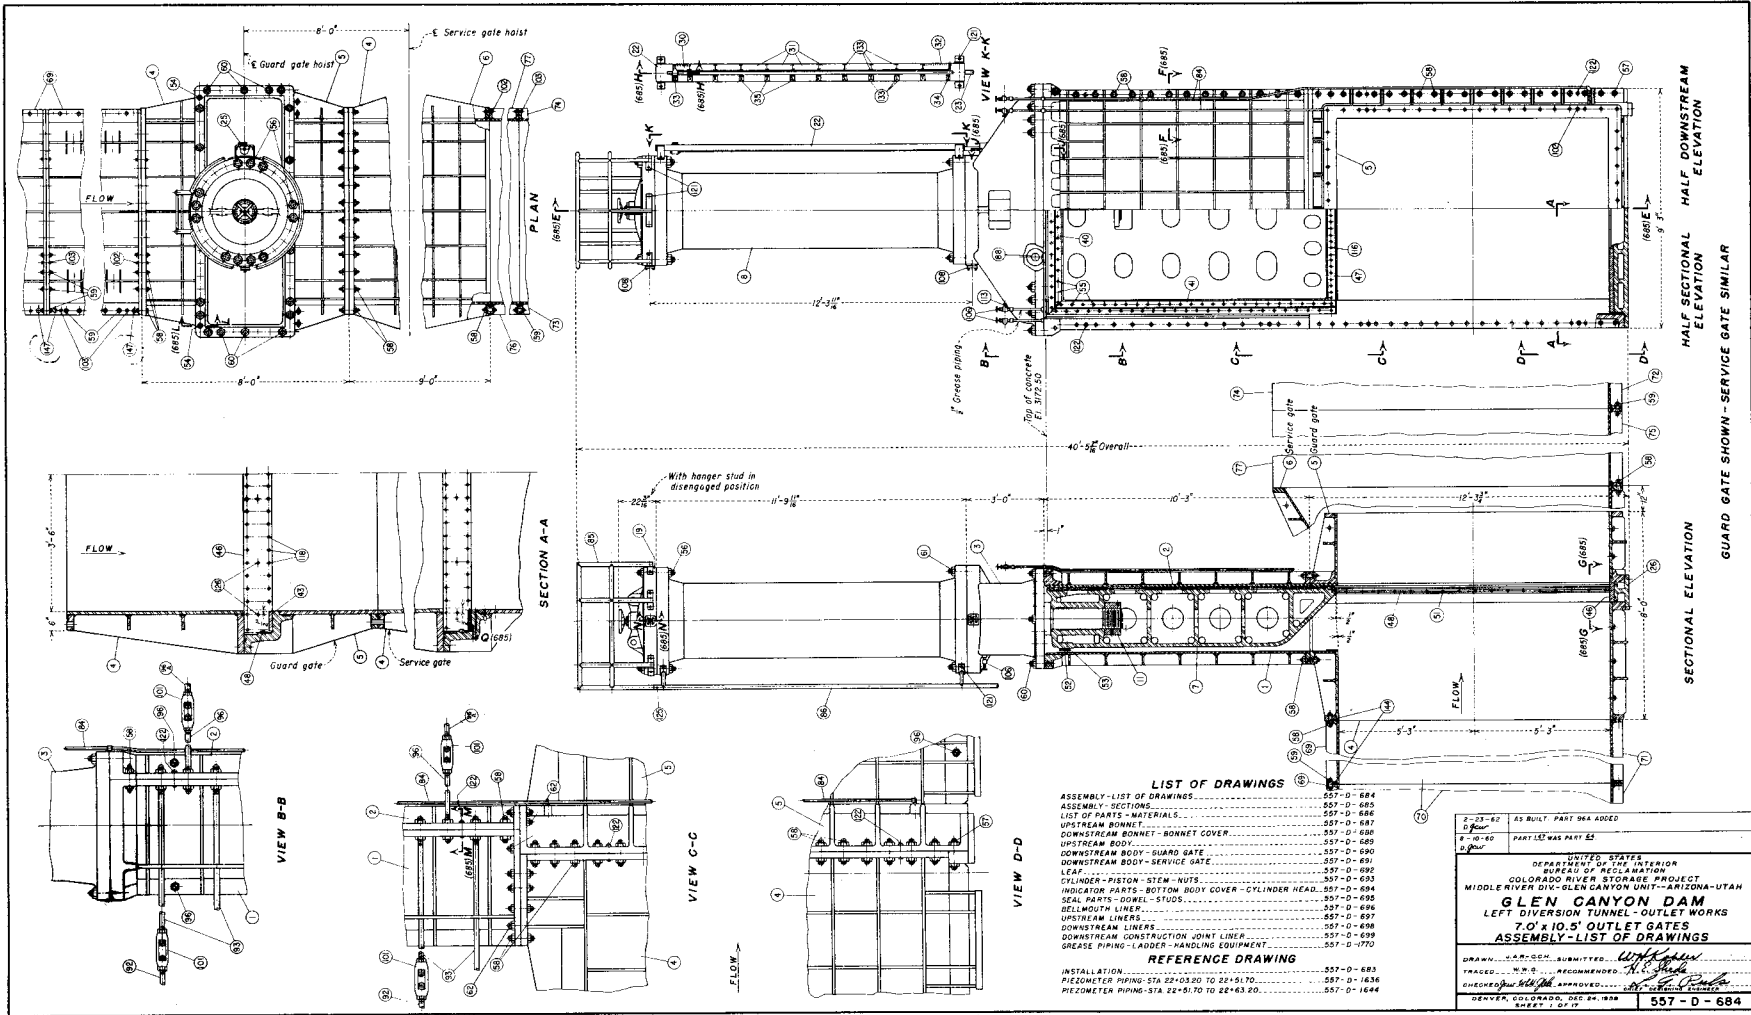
Left diversion tunnel outlet works—7.0- by 10.5-foot outlet gates assembly.
